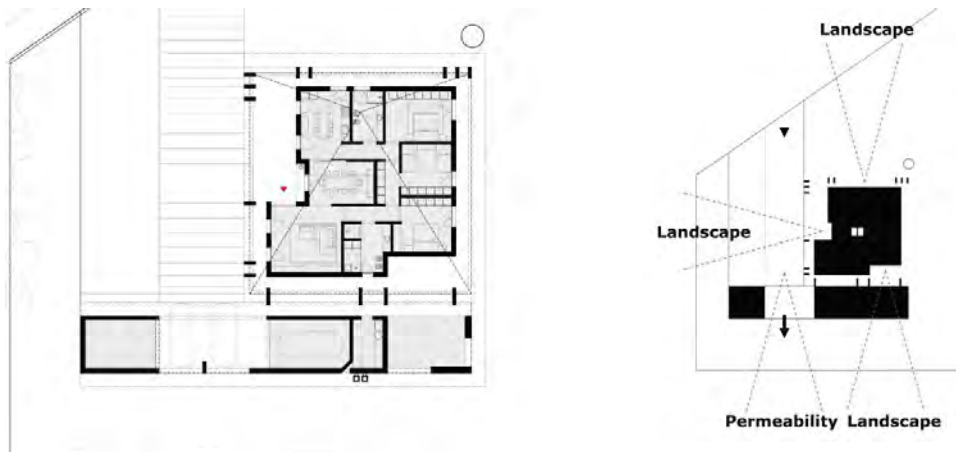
8 House, Sant'Agostino –Ferrara (KM429 Architects). Floor plan and visual layout. The plan has been designed to try to recreate an intimate atmosphere of protection, and at the same time opening towards the countryside, framing it in reserved visual cones.
